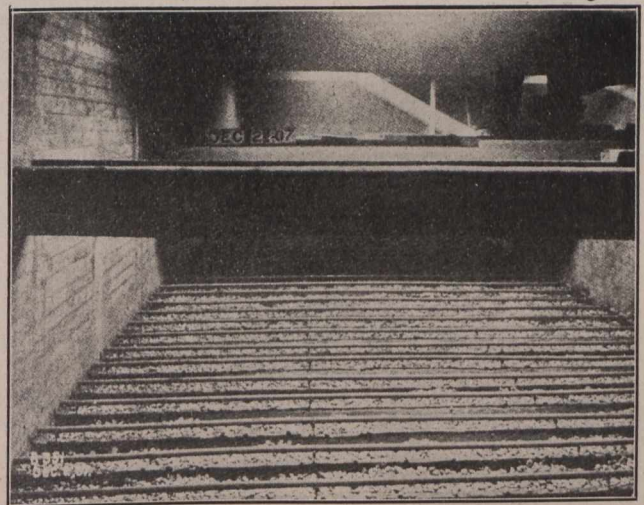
Filter, Scraping Machine, Pittsburg, Pa.
